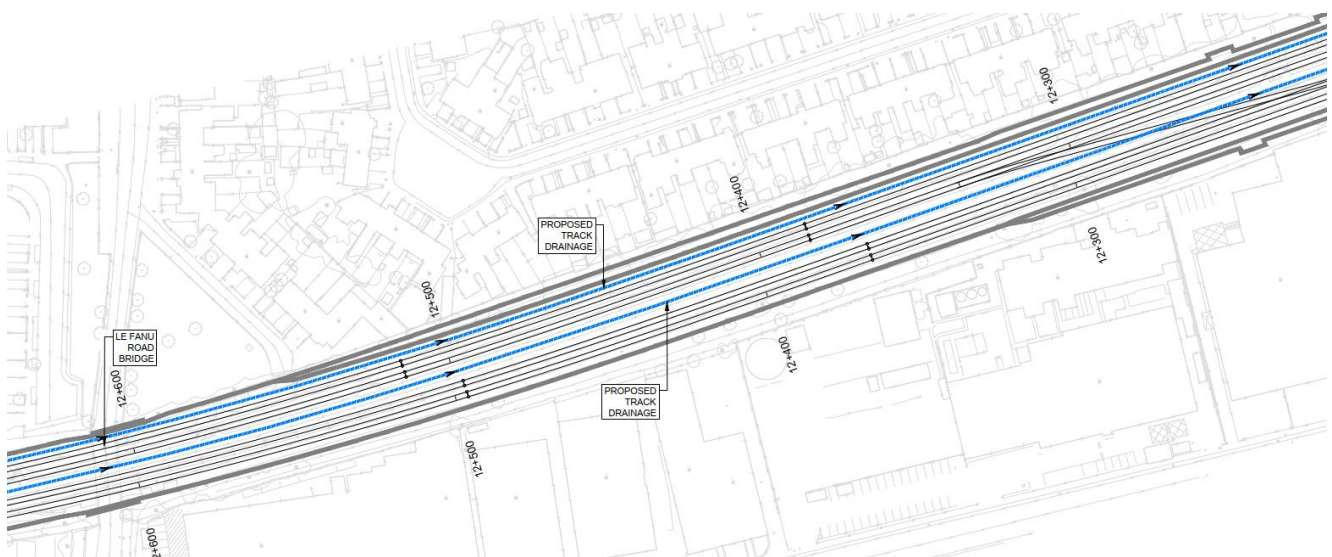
Proposed Track Drainage Layout between Le Fanu and Kylemore
